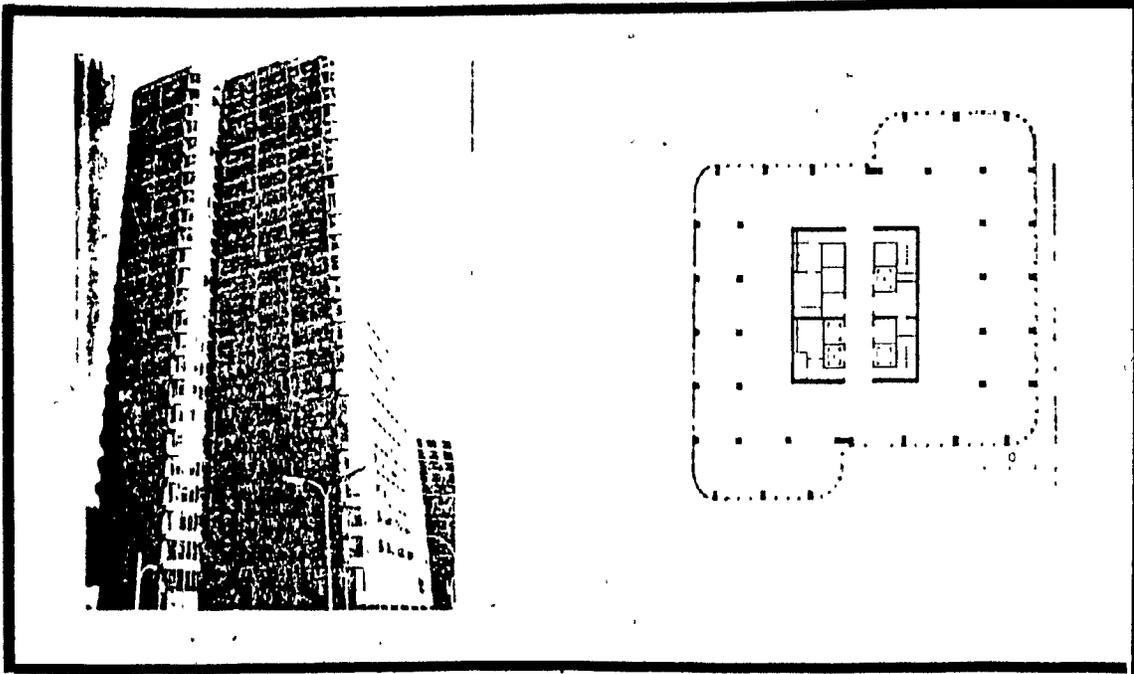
, 21 : The 26-storey office tower. Architect Vecsei wanted the building to be "slick and dark, highly polished and technical looking, in contrast to the hotel and apartment buildings"
